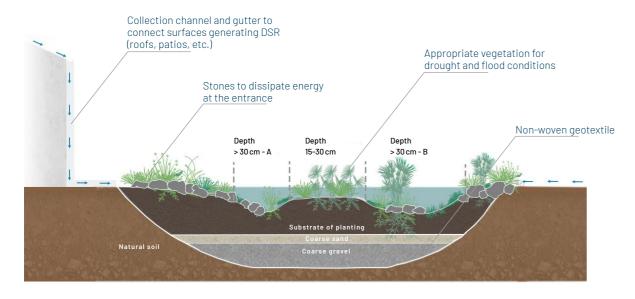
Rain garden - schematic cross-section (Source: Guajava, 2023).
